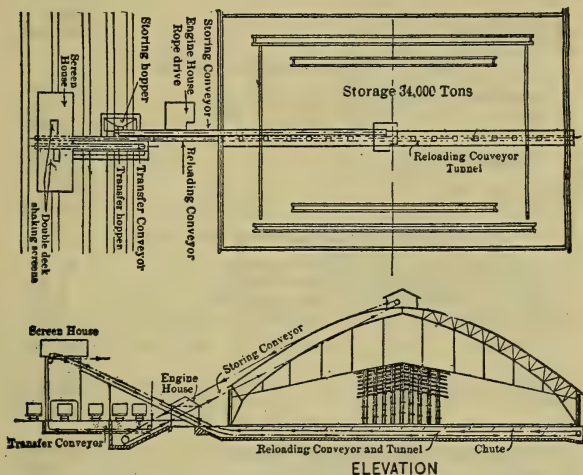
Wende storage plant, Lehigh Valley Coal Co., Buffalo, N. Y. Plan and cross section.
